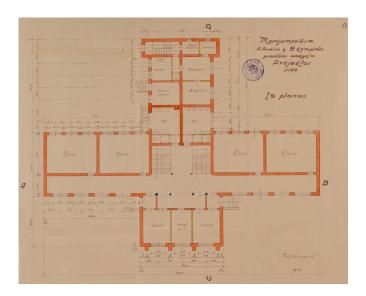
First floor plan of 8-class primary school building in Marijampolė (civ. eng. Juozas Dragašius, 1933) [drawing from LCVA].
